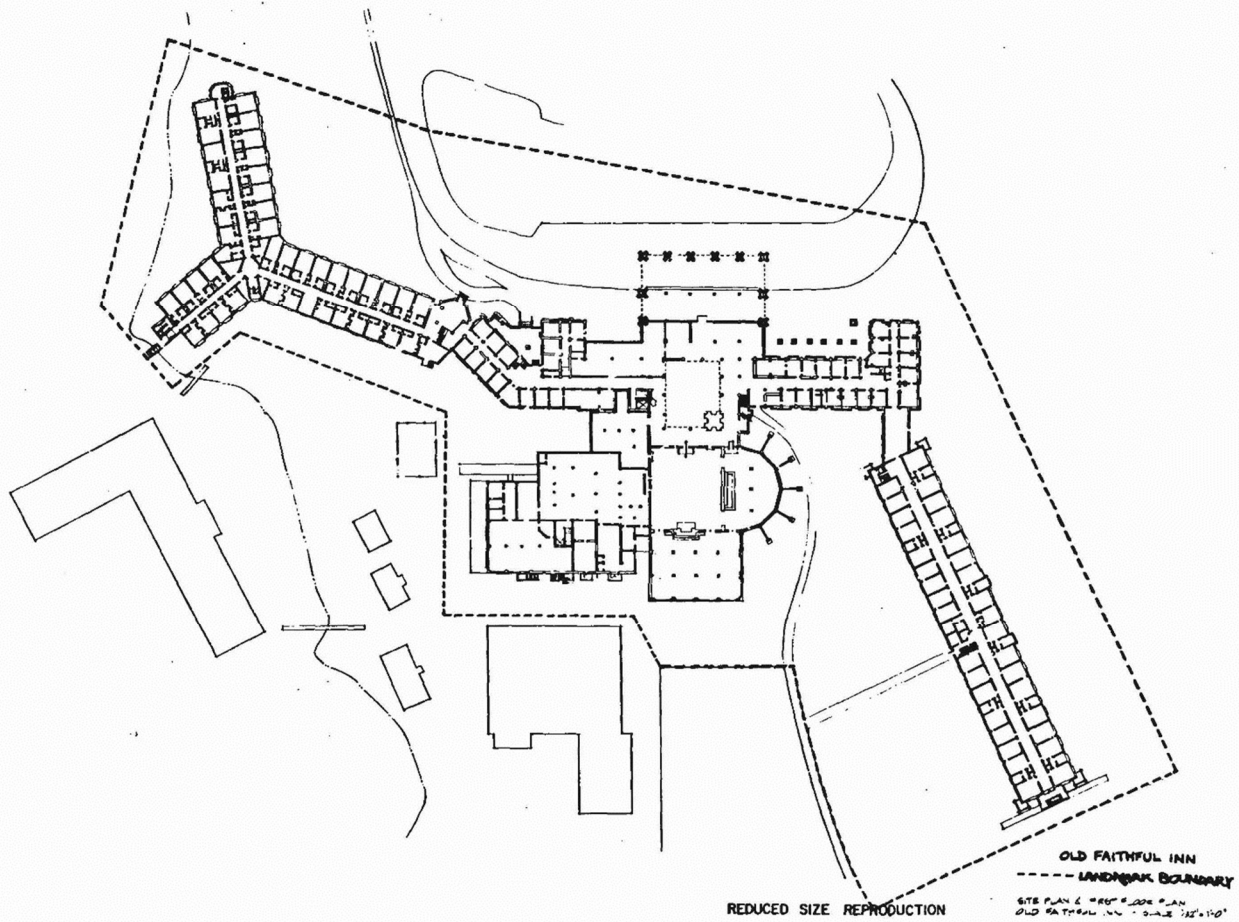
Robert C. Reamer, floor plan of Inn with Old House, East Wing, and West Wing drawn out, Old Faithful Inn, Yellowstone National Park, WY, 1973.⁵⁴
